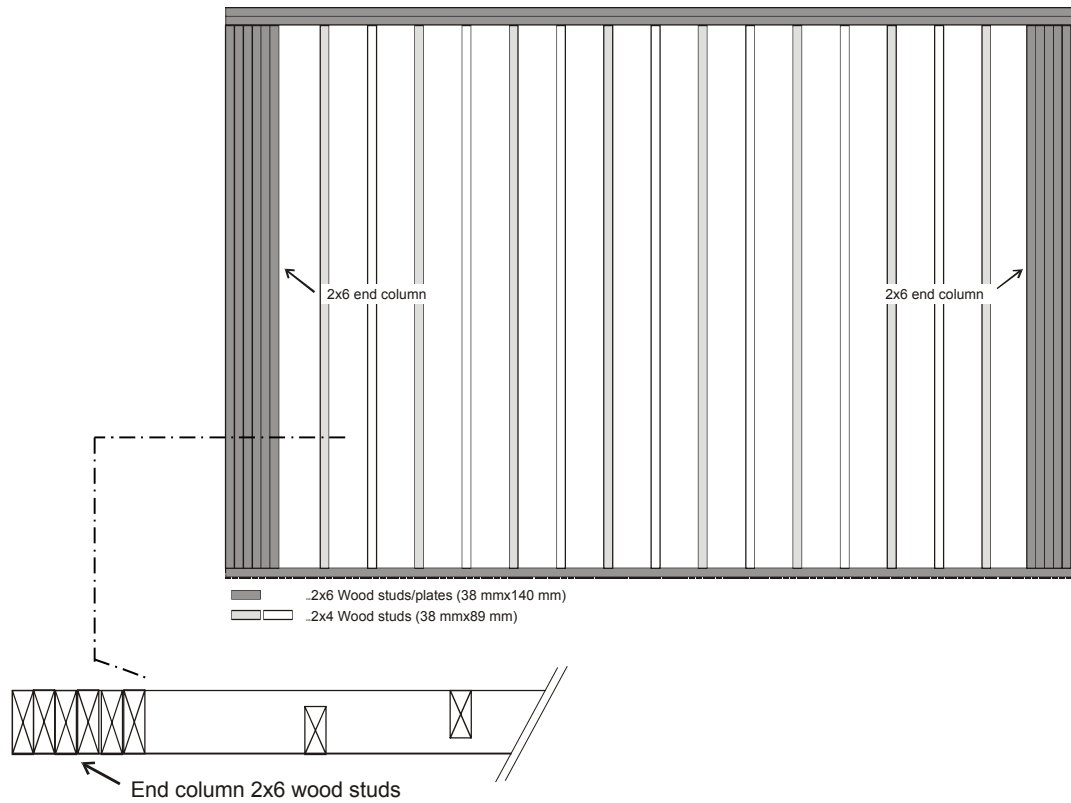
4: Framing details 2x4 staggered stud wall with studs spaced 400 mm on centre with 2x6 end columns
